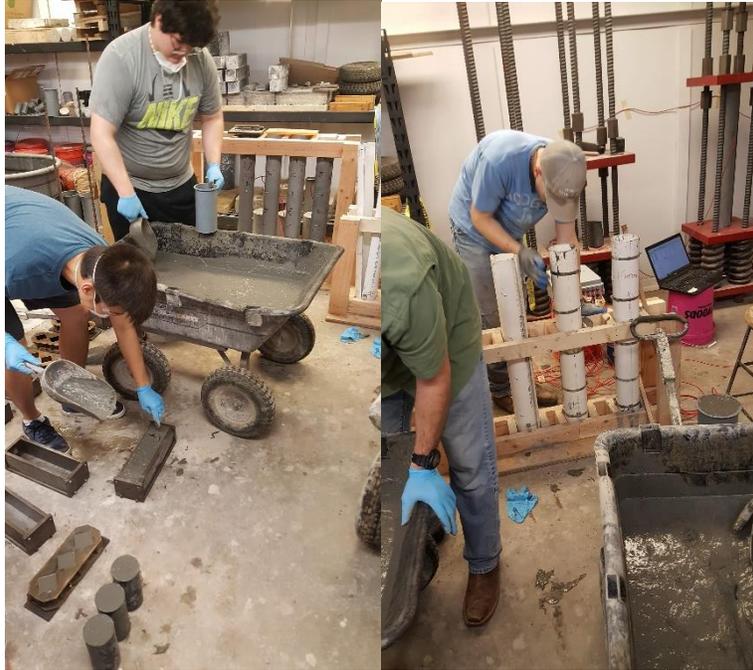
Casting of compression, shrinkage, and modulus of rupture test specimens (left) and creep specimens (right) for the 6% fiber mix
